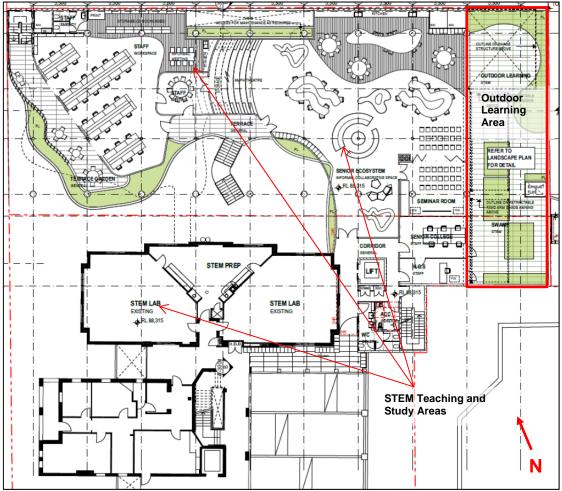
Level 1 Plan showing new senior study areas, staff areas and terrace and enclosed outdoor learning area (Source: EIS)
